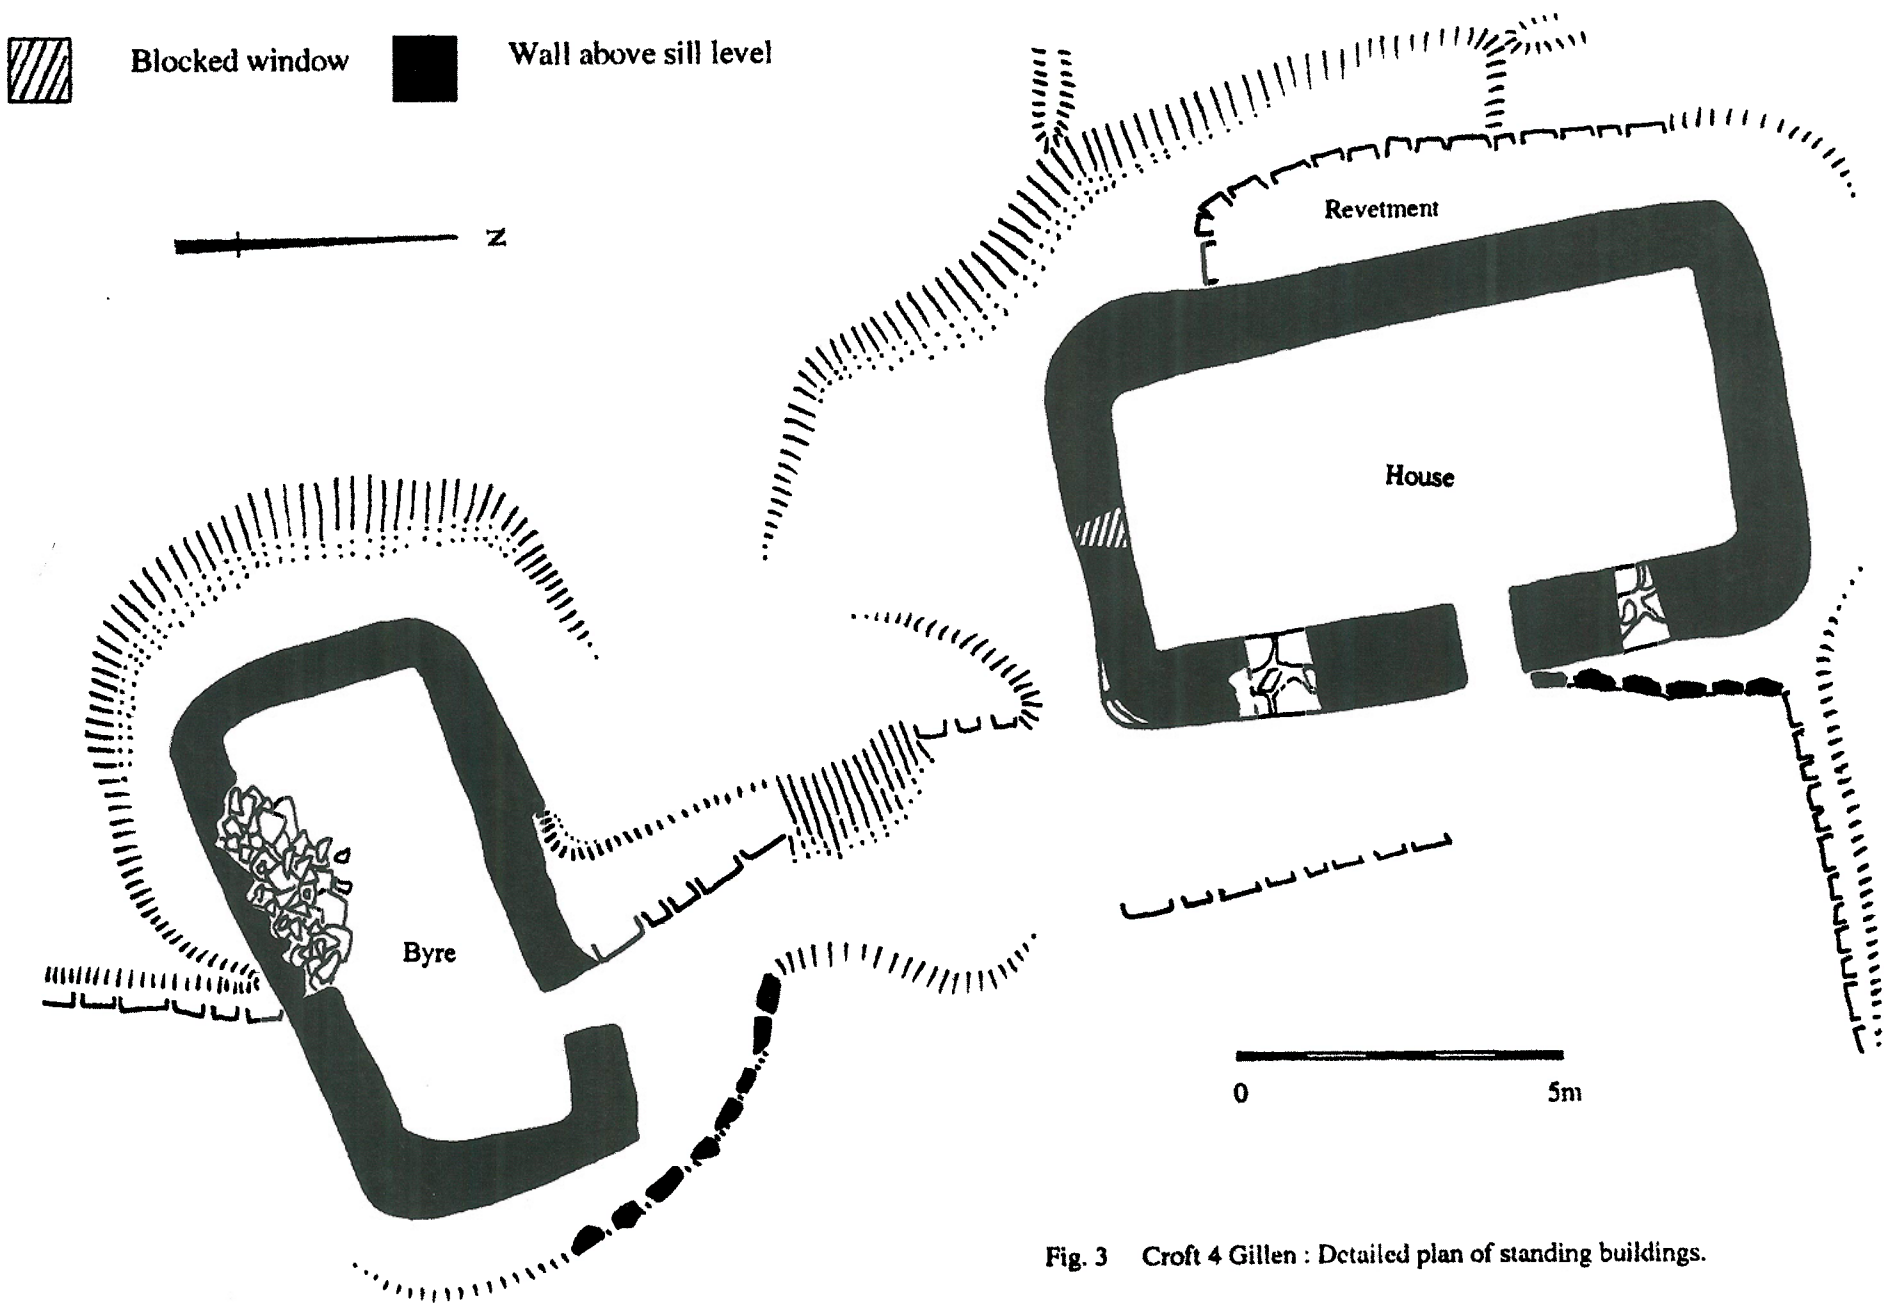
Croft 4 Gillen : Detailed plan of standing buildings.
